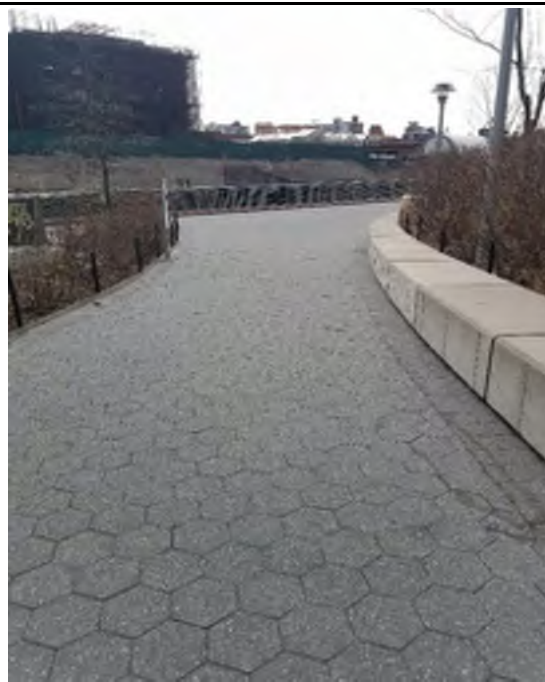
Typical hairline/surficial crack observed on sidewalks, facing northeast. Cracks did not breach to the subsurface. 27 February 2019.
